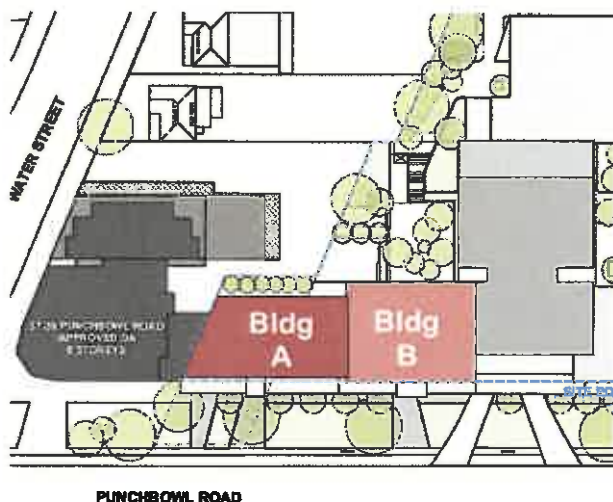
Site Plan showing the Adjoining Site and Buildings A and B
